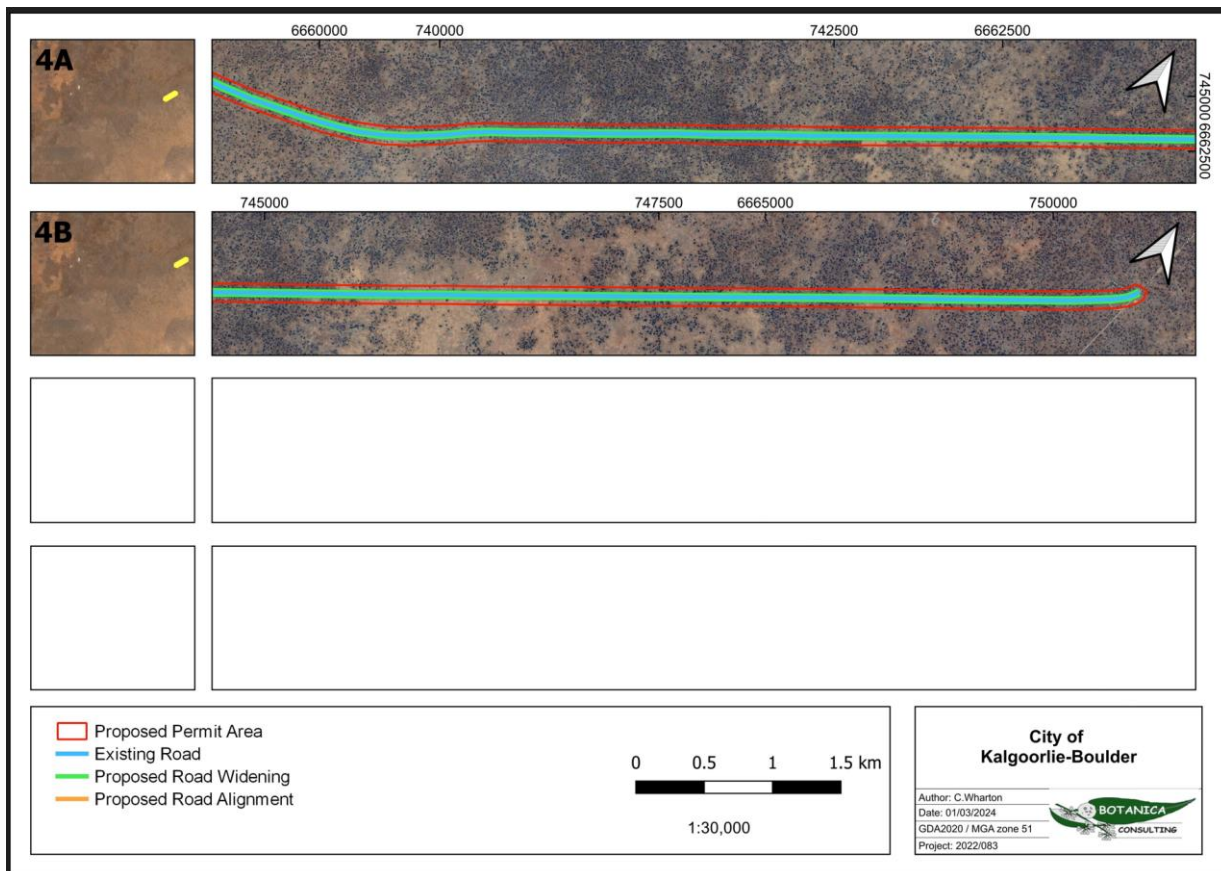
Proposed Road widening, and alignment works within the application area (Map 4 of 4)
